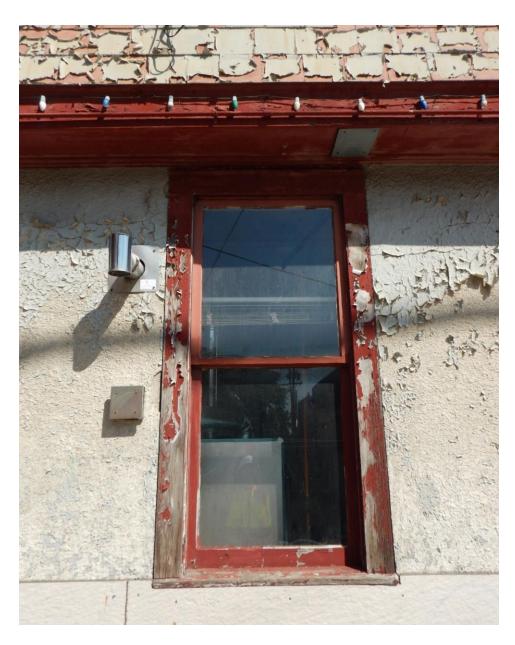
SOUTH ELEVATION WINDOW DETAIL
